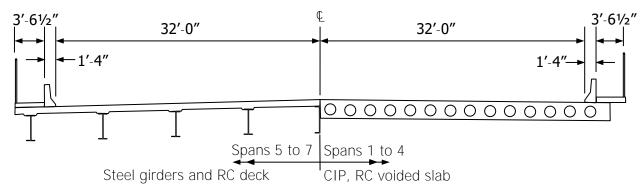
Typical cross-sections and dimensions for Bridge Number 15558X.
